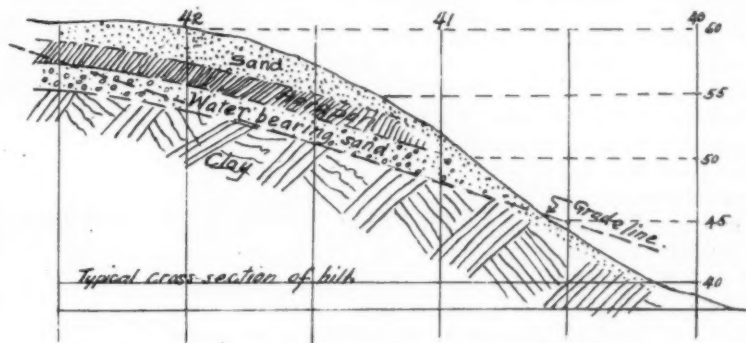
TYPICAL CROSS-SECTION OF HILL, SHOWING SOIL STRATA.
